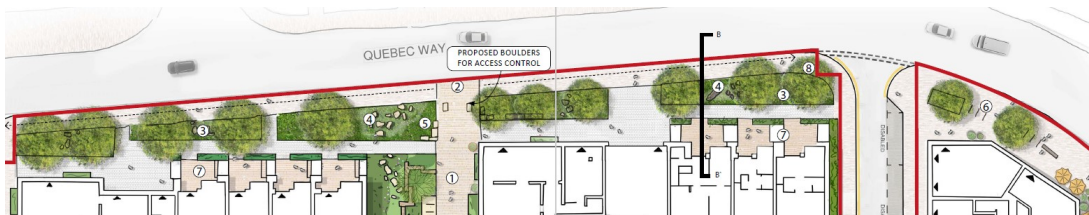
(above): Section through Quebec Way. Figure 57 (below): Plan of Quebec Way.
